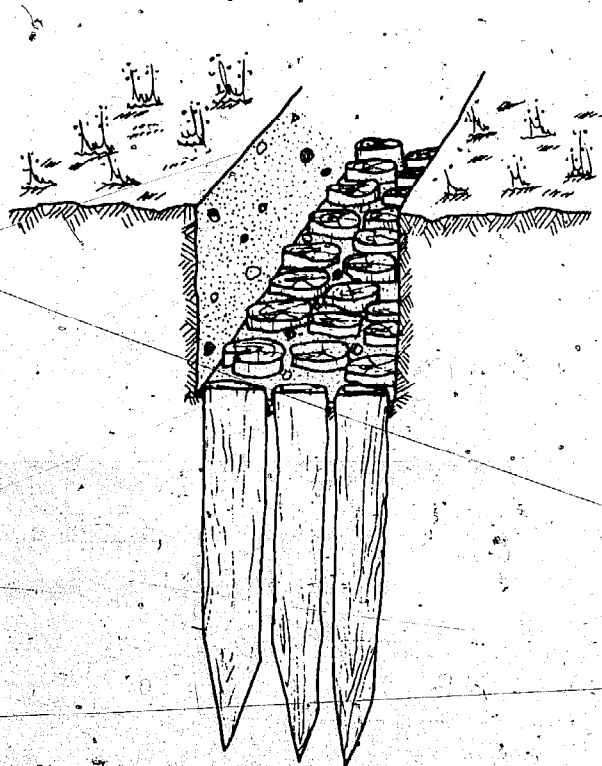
Hardwood piles for foundations at muddy or filled sites.
